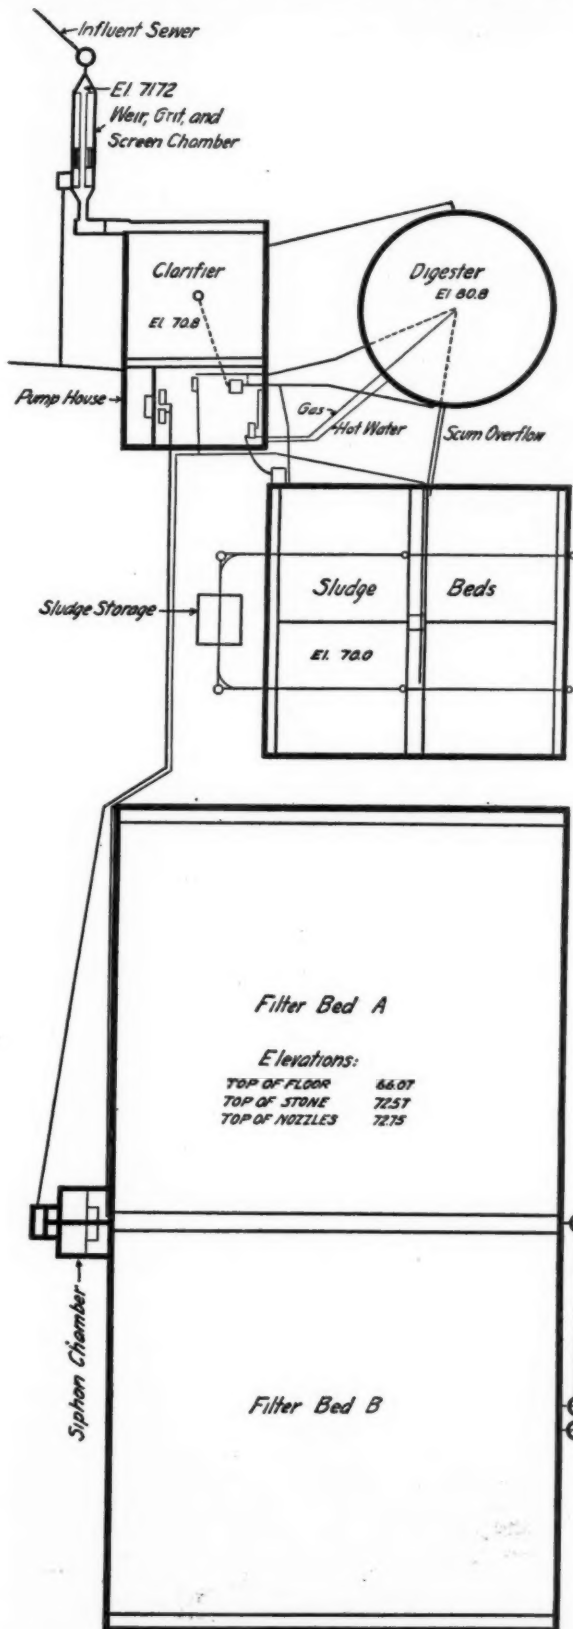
CONSTRUCTION LAYOUT OF ANTIGO DISPOSAL PLANT.
